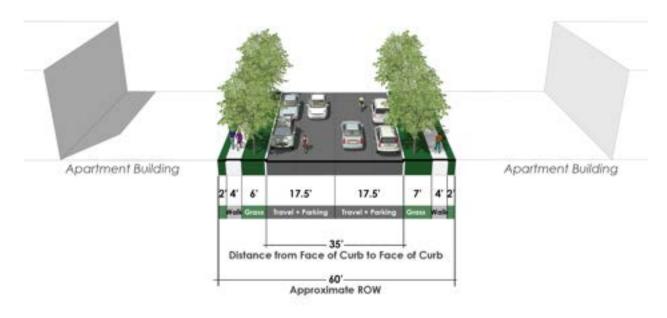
Kanawha Street – Existing Cross-Section (Looking East)
